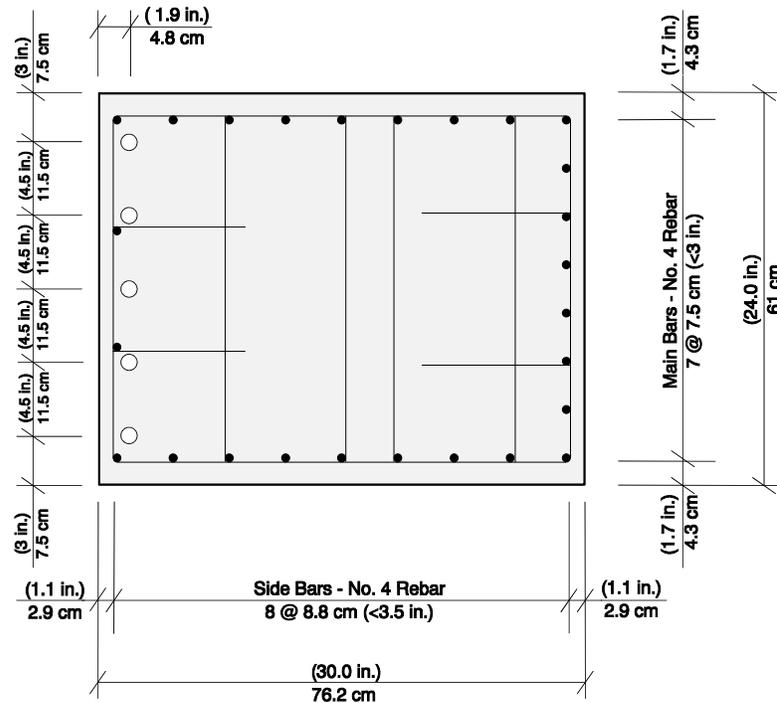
POJ-PU-74-TH pier reinforcement details
